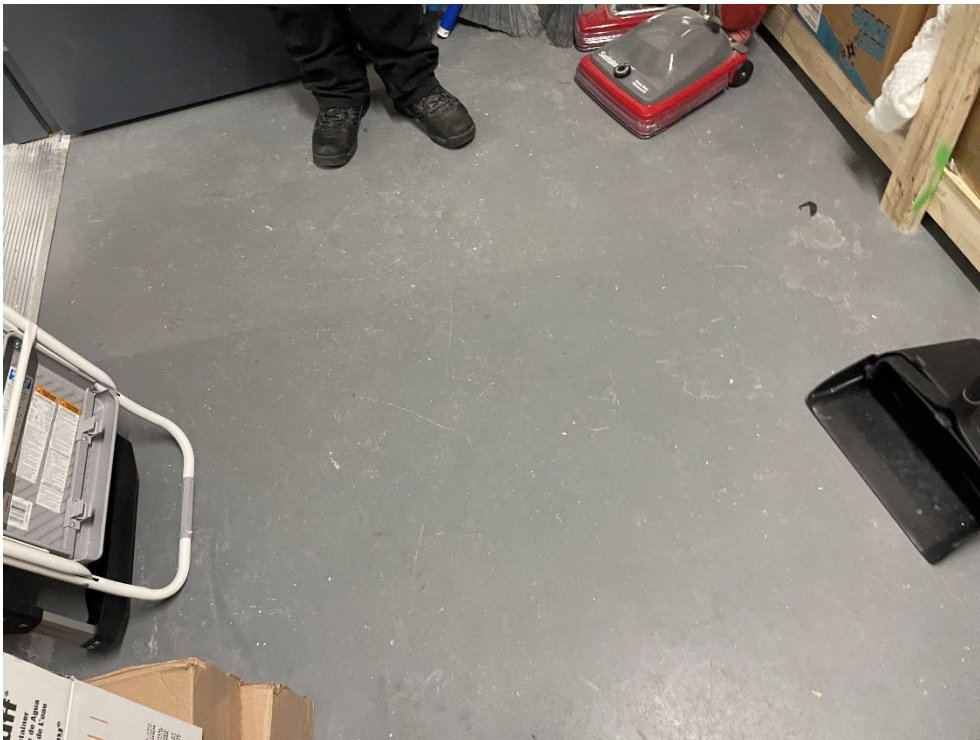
Photo of the concrete slab in a storage room in the Site's cellar.
